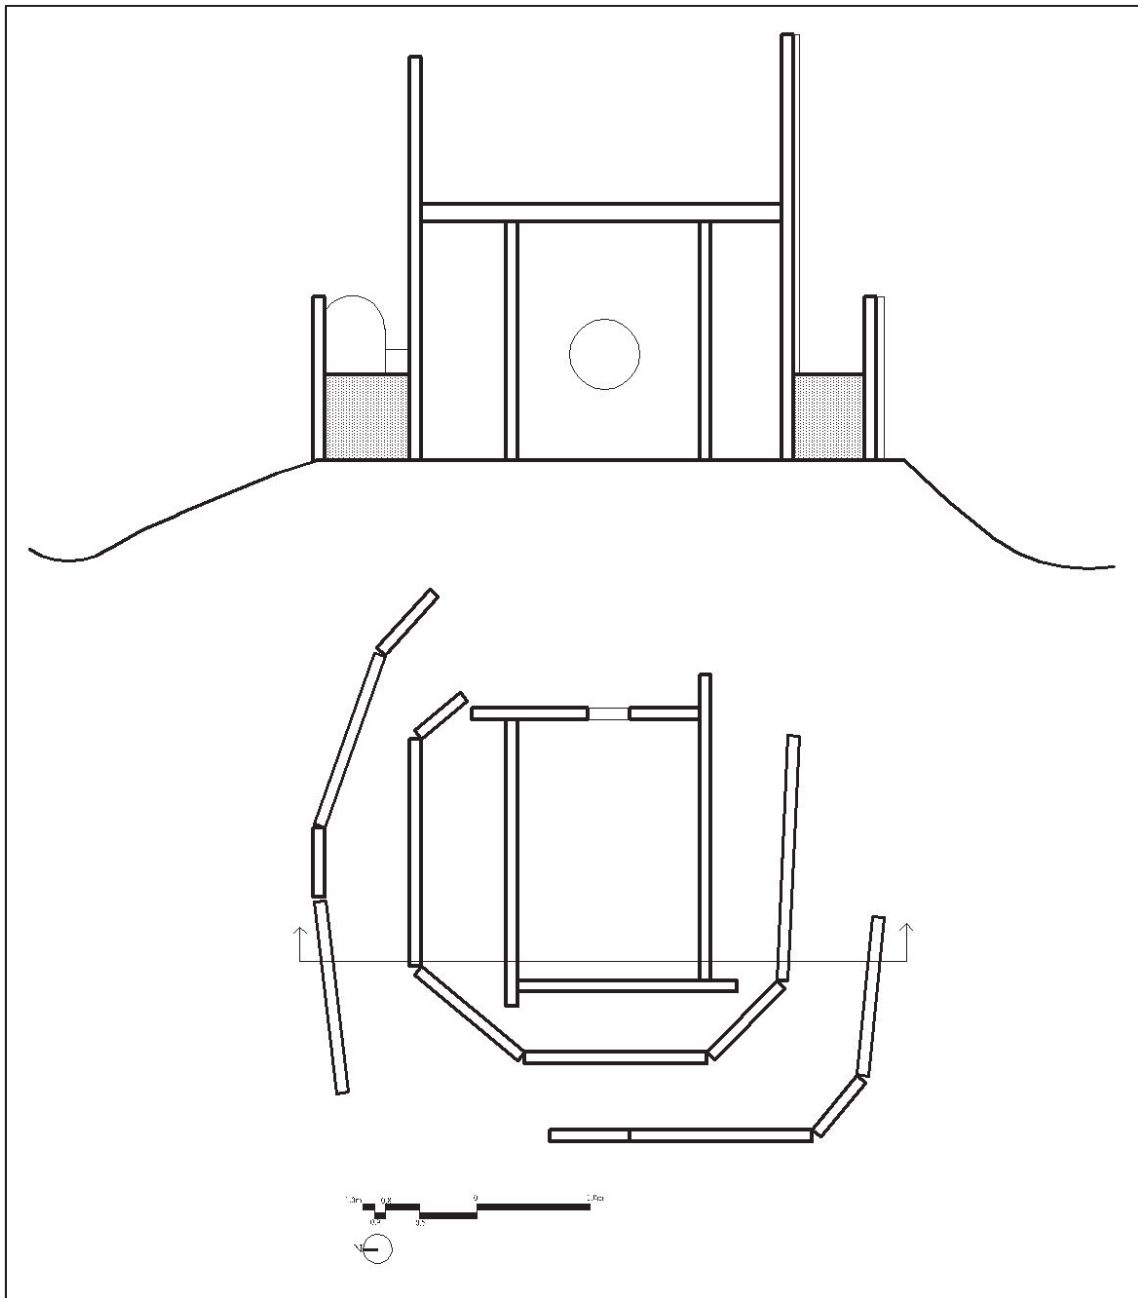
Plan (below) and section of the dolmen at Mallasandram
